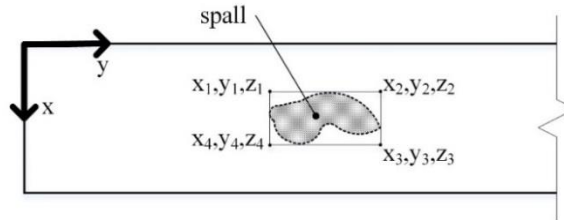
Illustration. Location of local element origin and defect coordinates on pier cap with square end— plan view.
